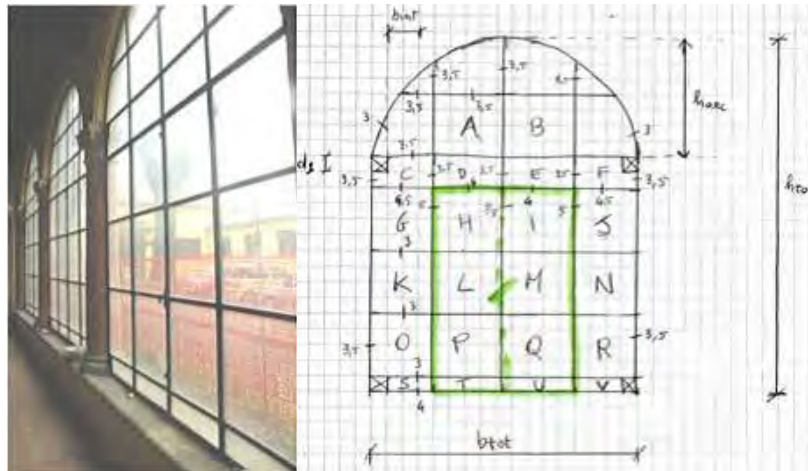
and 10\_ Photo and sketch WGF1, ground floor
